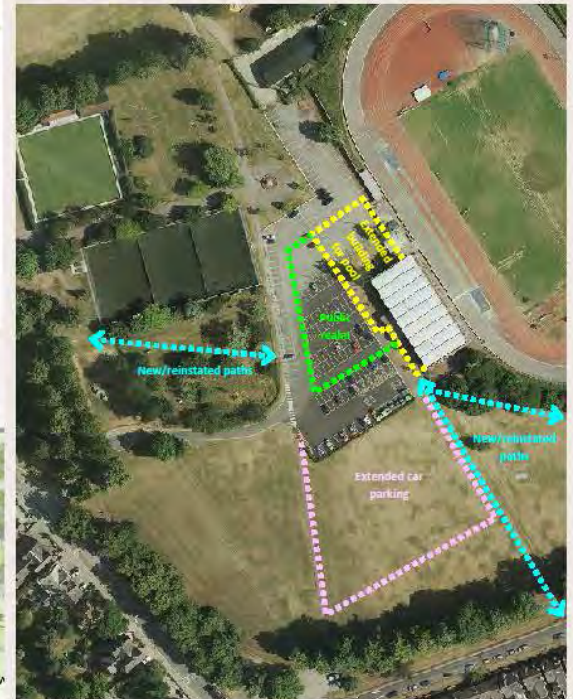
ILLUSTRATIVE MASSING PLAN - EXISTING (POOL BUILDING OPT 1)
